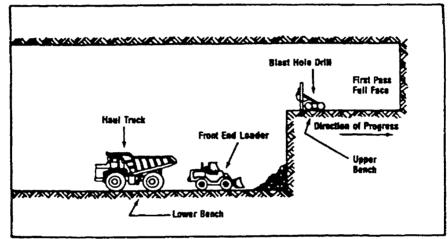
Underground Bench Mining Operation (Archibald, 1991)
